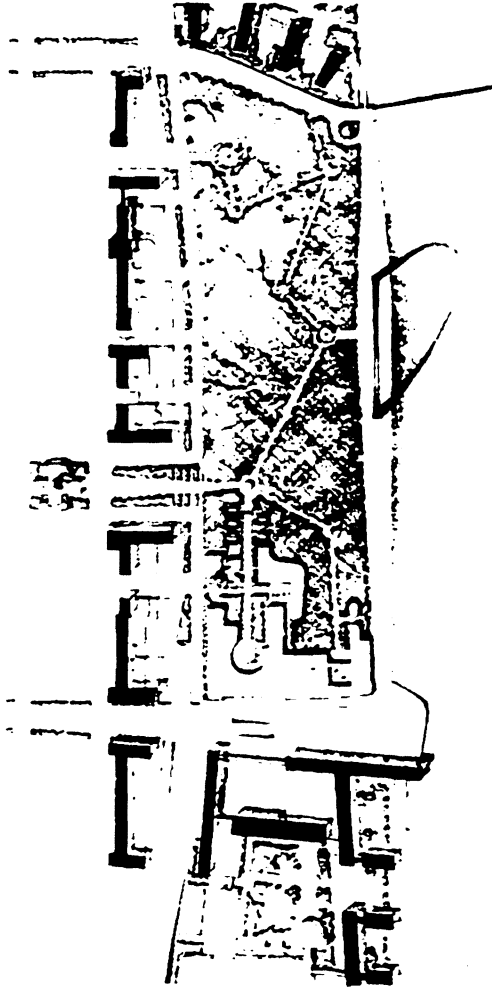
Eero Saarinen. Drawing no. 1: Sketch site plan, first stage.
